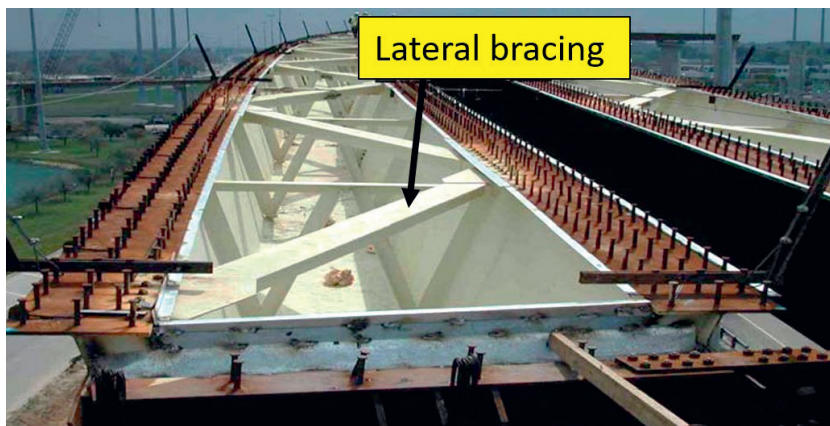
Lateral bracing between the top flanges of a trapezoidal box-girder during construction (Helwig et al., 2007).
